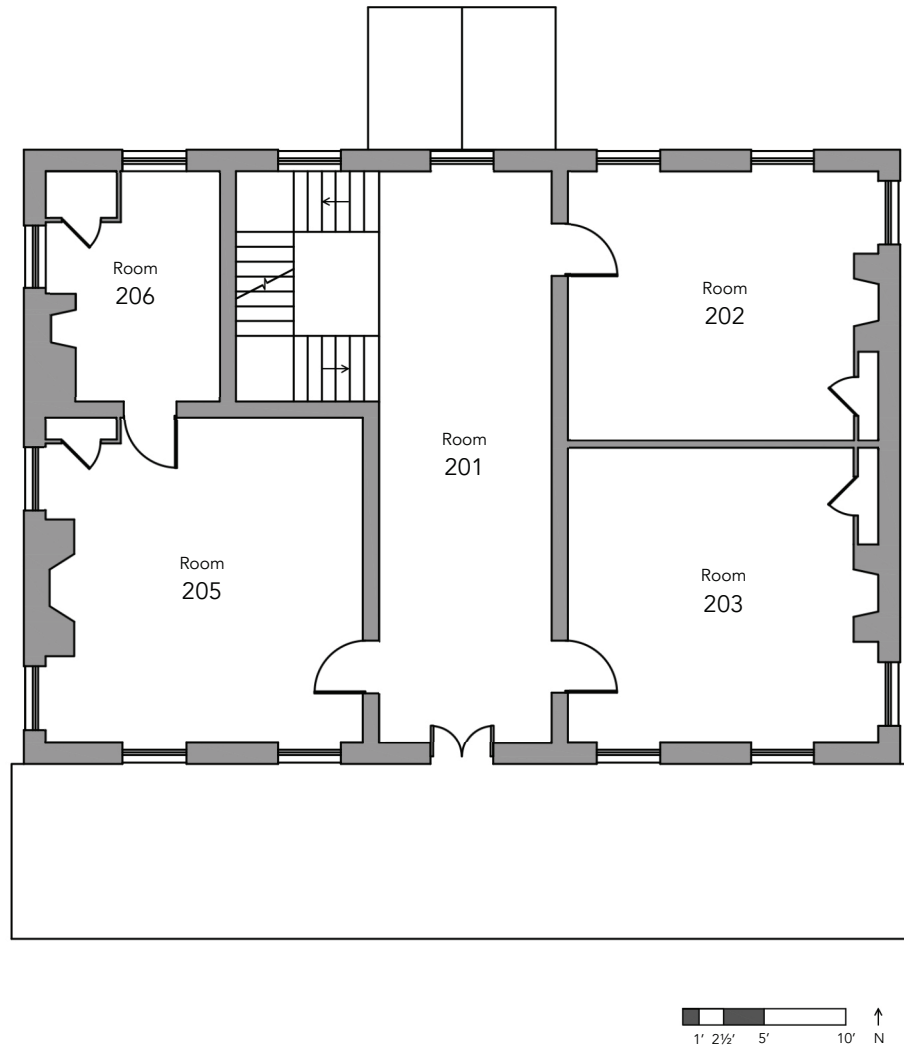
Second Floor Plan of the McConnell-Busti Country House. Drawn by author, 2016.
